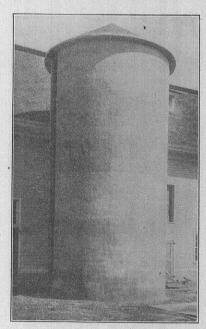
This concrete silo, erected the year on the University Hill Farm, was made with a new type of mold devised by the Agricultural Engineering Department. It is 14 feet in dlameter, 25 feet high, with six inch solid reinforced walls. The roof is of concrete four inches thick. It required 50 barrels of cement, 28 yards of crushed stone and 16 yards of sand. Reinforcement cost \$25, doors \$4.60. The material cost \$129, rent of staging \$5, labor \$159, total \$293. It holds 100 tons of silage.
